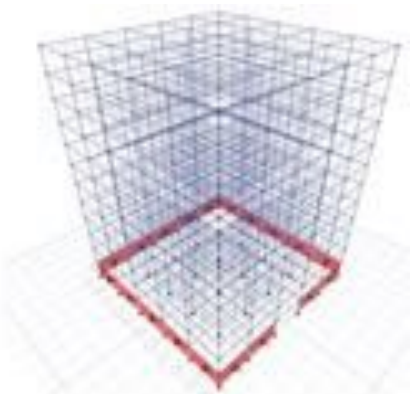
D Elevation of 12 Storey Building (Model 2A)
